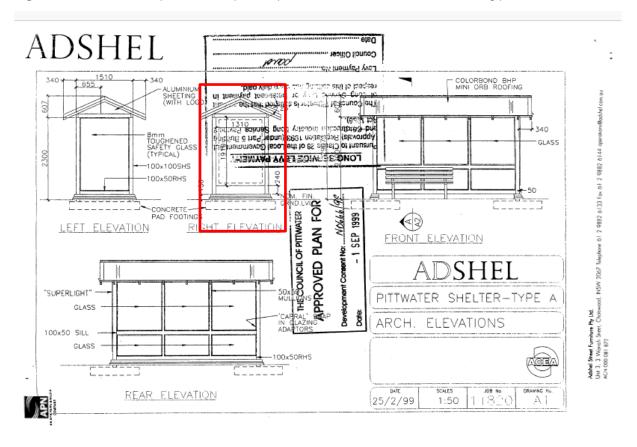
Shelter C5 DA0666/99 Stamped Elevations 1 of 2
